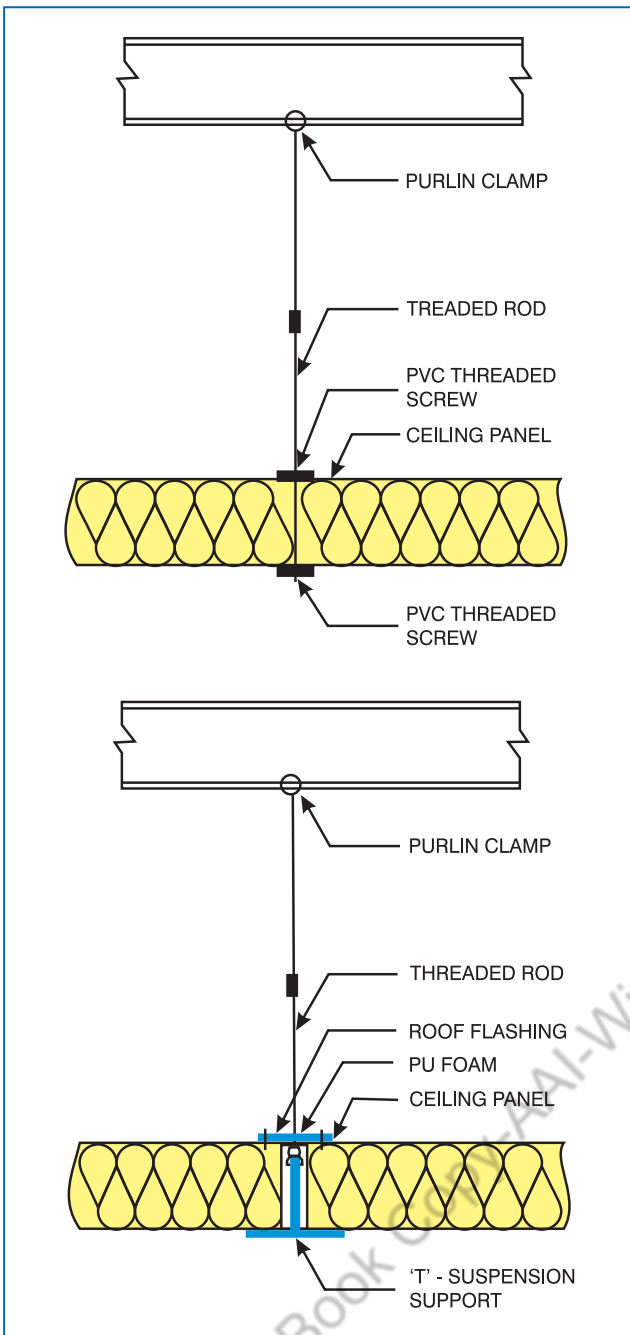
Fixing ceiling suspended panels with PVC threaded screws
